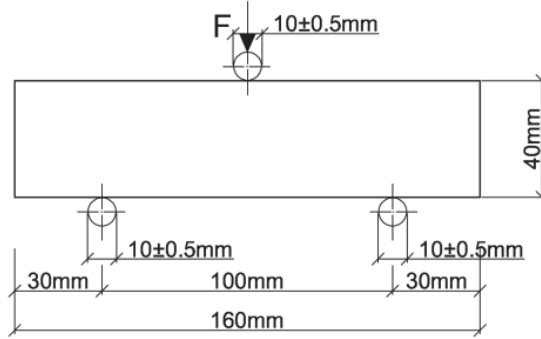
A loading arrangement for testing flexural strength of cement mortar on a prism specimen according to PN-EN 196-1
